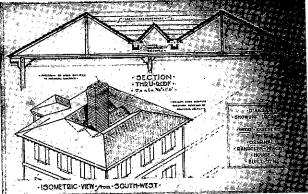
Restored bird's-eye and sectional views of western end of house, as delineated by Singleton Moorehead about 1940. The wooden belt course was not added until the building was extended to the east during the mid-eighteenth century.
